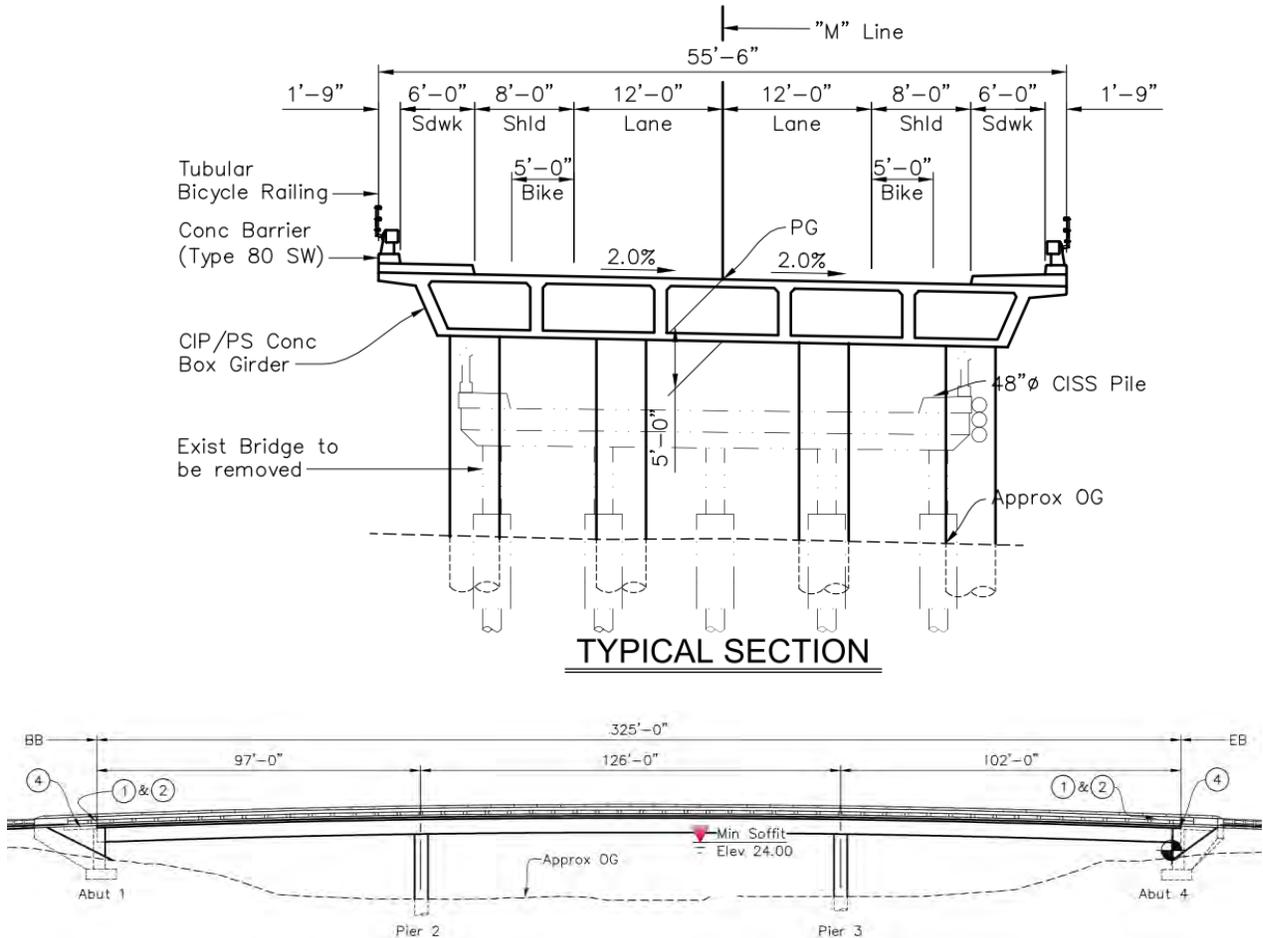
Alternative 1 CIP/PS Box Girder Bridge typical section and bridge profile
